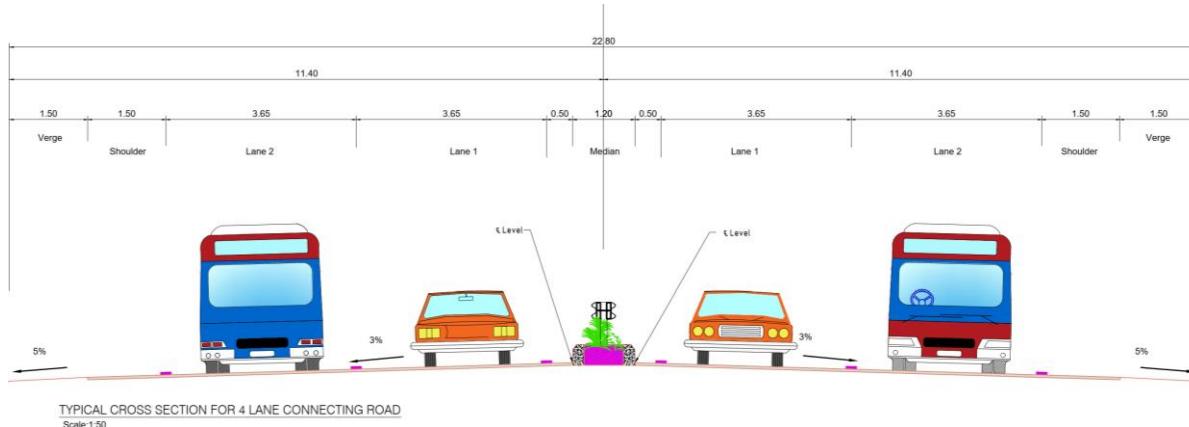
Proposed Approach Road Cross-section for Eastern Part-1, Connecting Road
